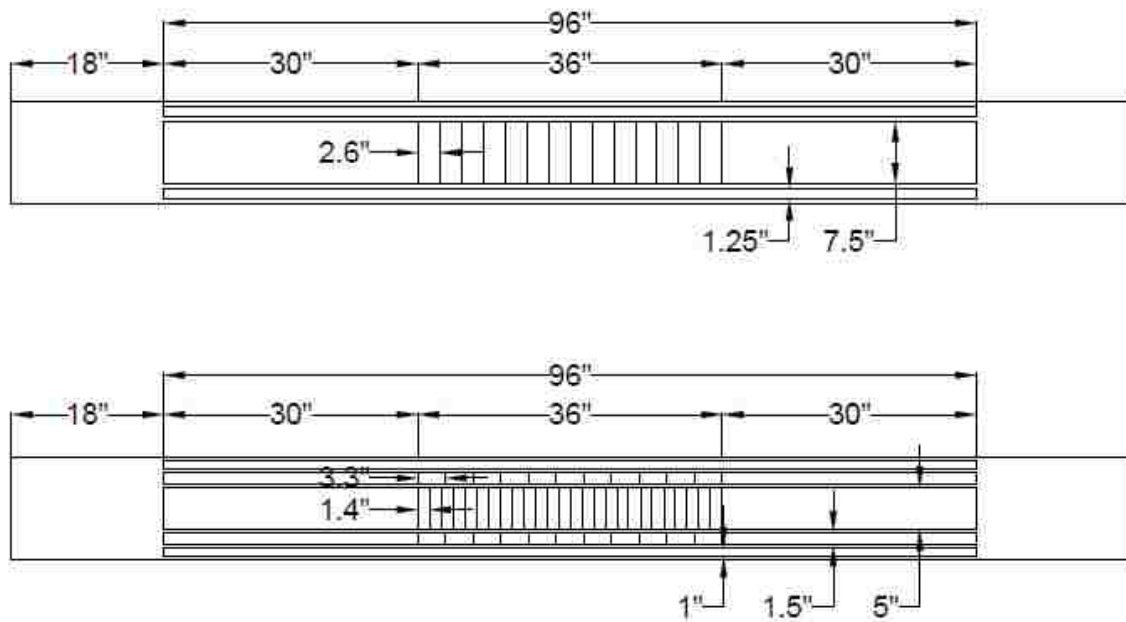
FRP Dimensions: Beam 2 and Beam 3
